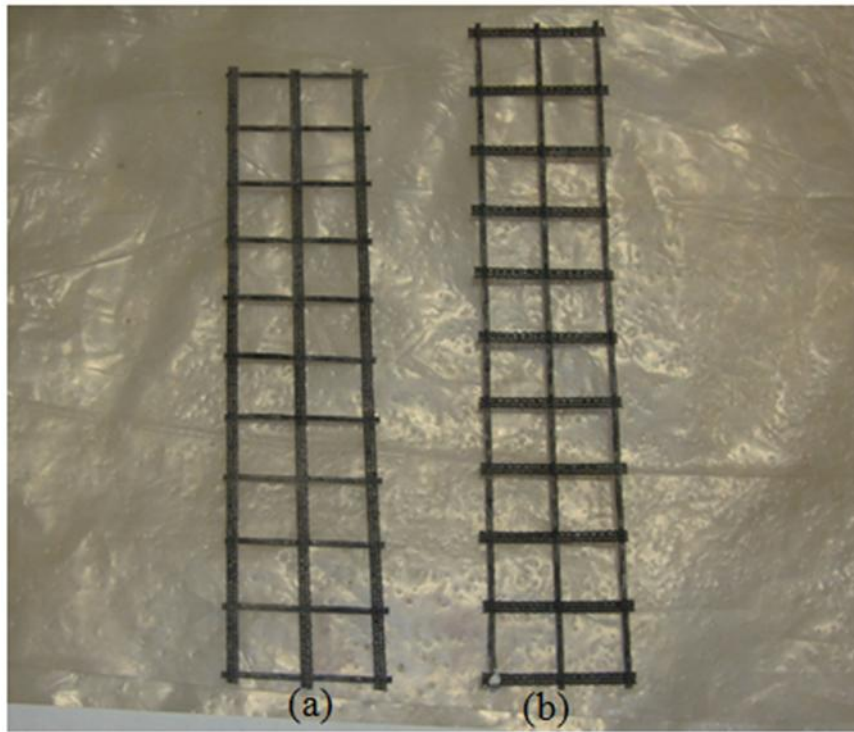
Damaged KGG1 geogrid rib strength test specimens before the test: (a) machine direction, (b) cross-machine direction
